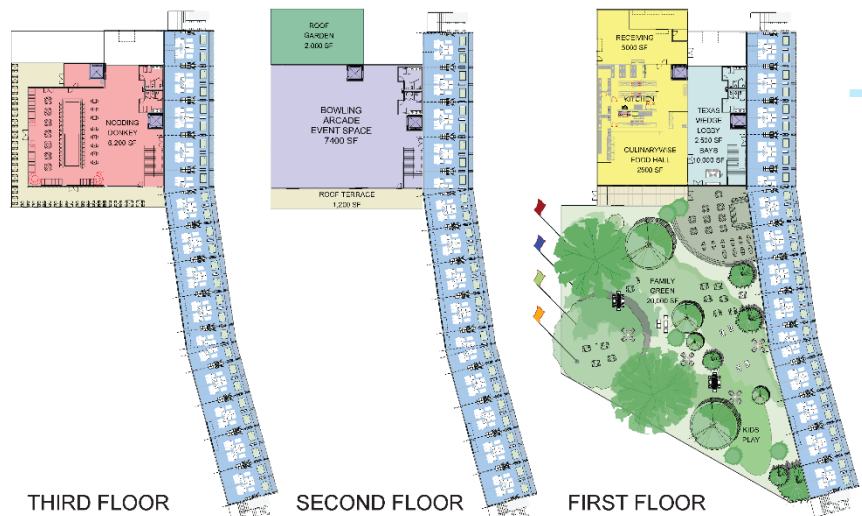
CONCEPT FLOOR PLAN FOR THE FACILITY
